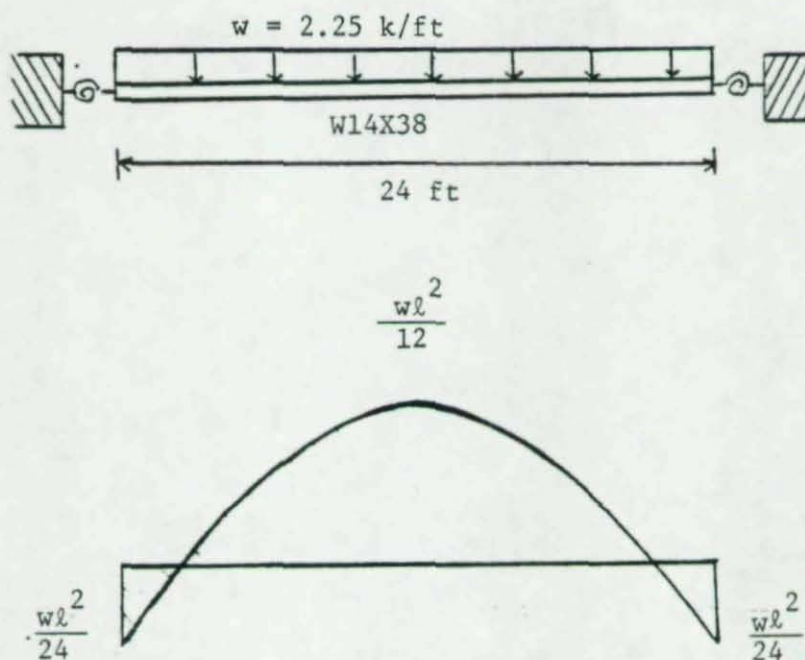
SCHEMATIC OF LOADING SYSTEM FOR TEST BEAMS
